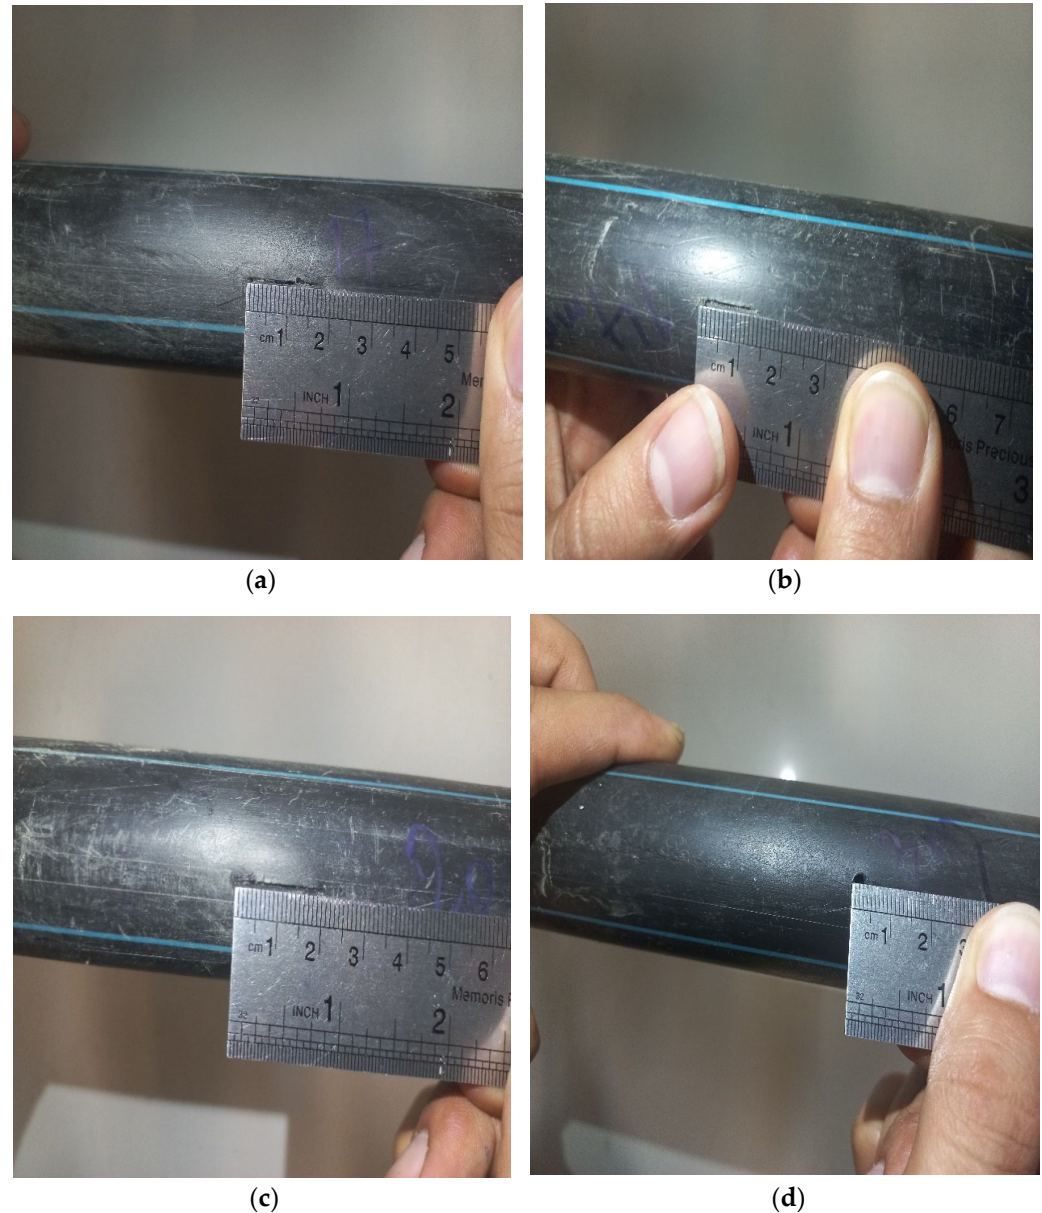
Various failures created on the pipes: (a) 14 mm crack, (b) 17 mm crack, (c) 20 mm crack, and (d) 3 mm hole.
